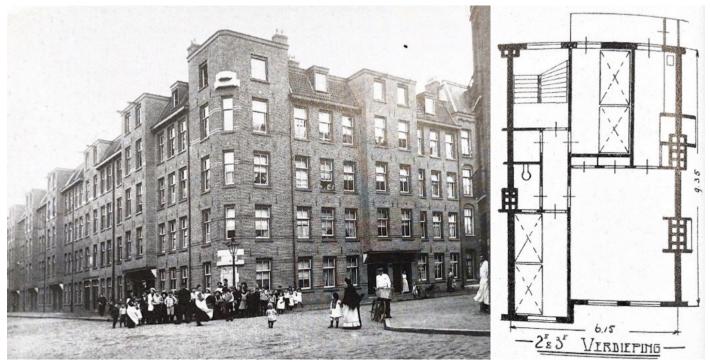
J.E. van der Pek, first block of Rochdale (1907-1909): facades Van Beuningenstraat corner Fannius Scholtenstraat & typical dwelling floor plan 1913. (Stissi, 2007a, p. 42)
